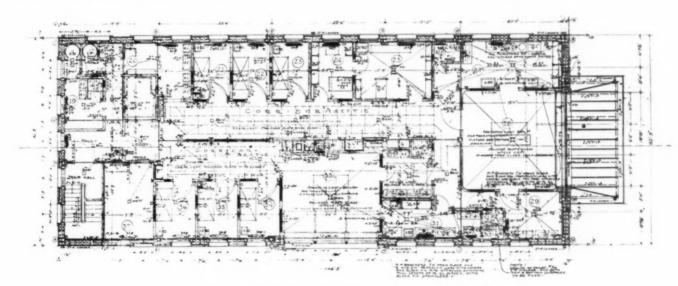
Sea View Hospital-Second floor plan, surgical pavilion.
